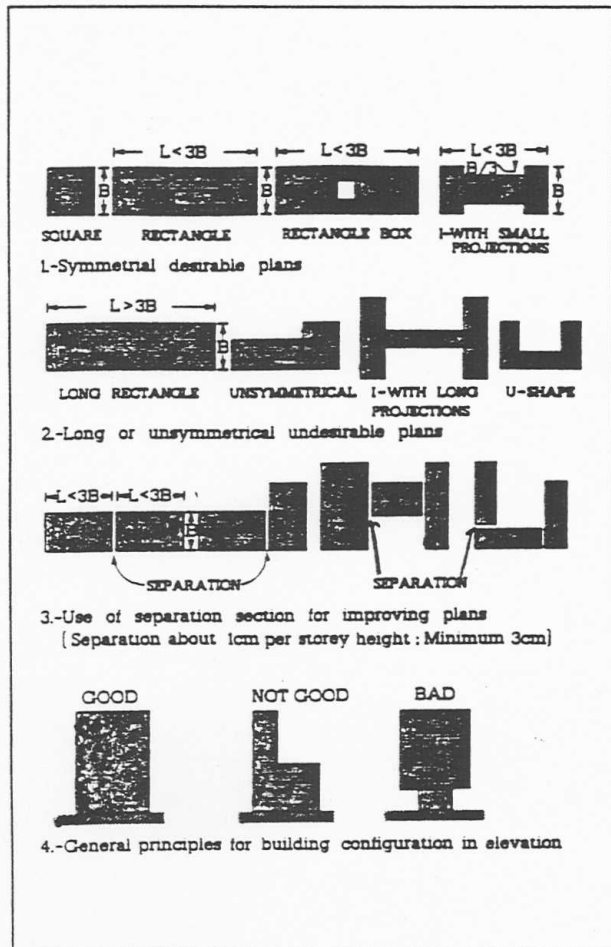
Plans, shapes of Building Blocks [1]
